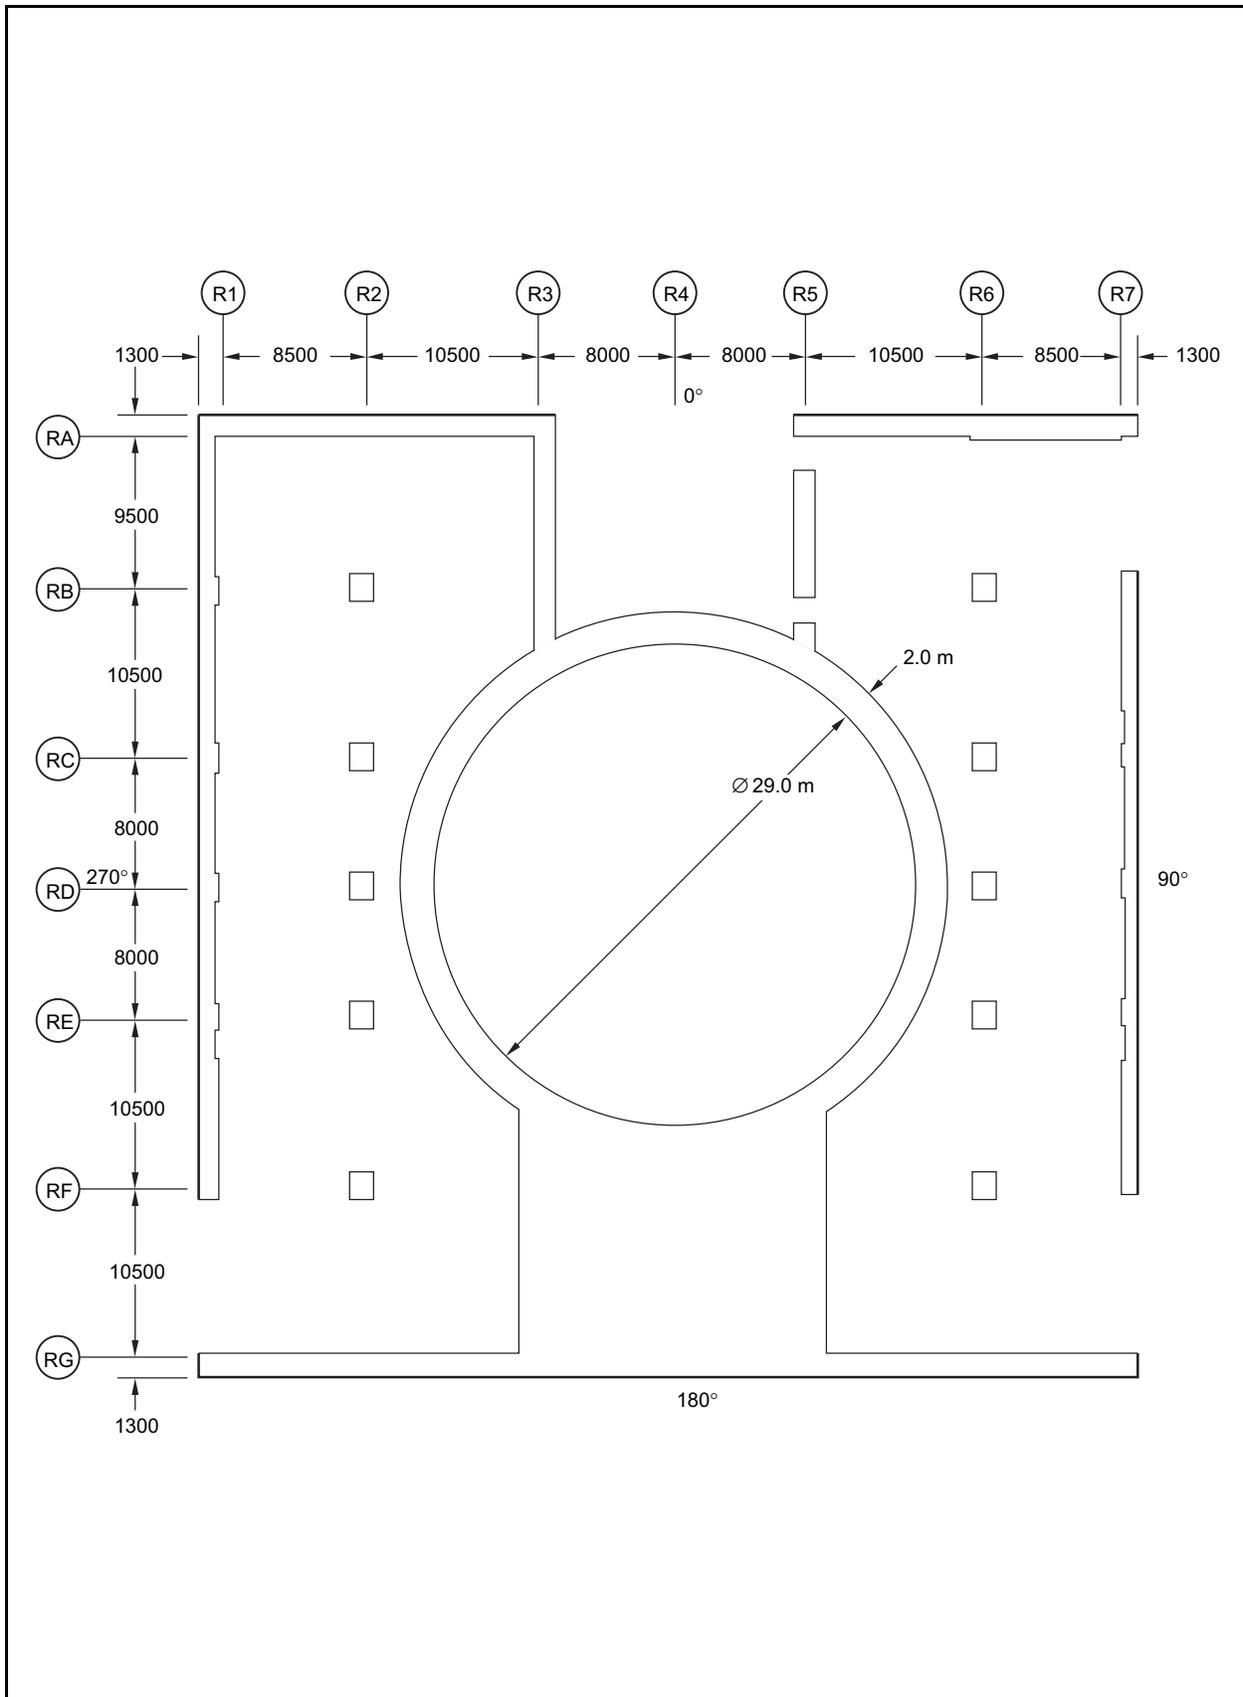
Reactor Building Arrangement Floor 2F Elevation 18100 mm
